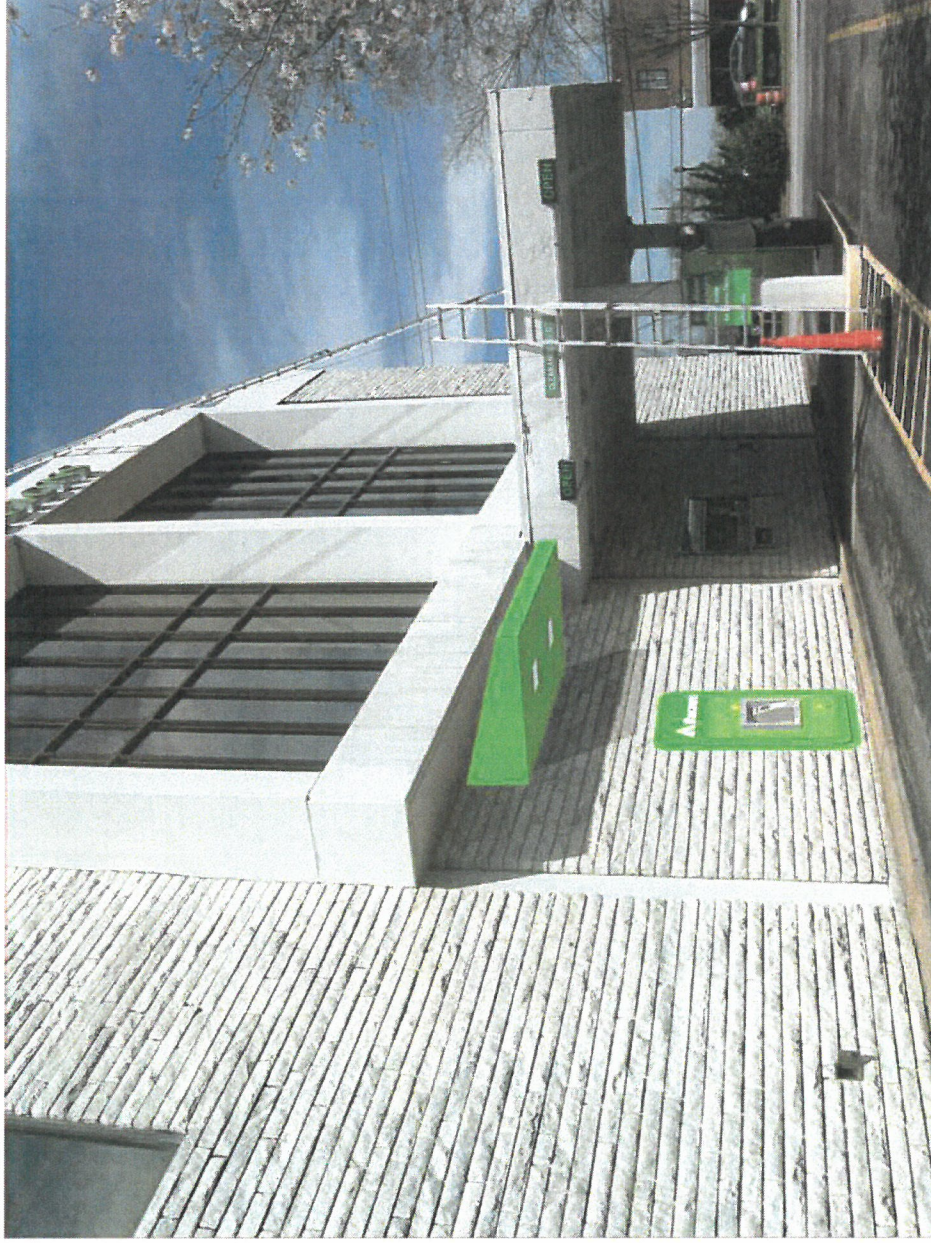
PHOTO ELEVATION DEPICTION INTENDED FOR GENERAL CONCEPT ILLUSTRATION ACTUAL SIZING, COLORS & PERSPECTIVE WILL VARY SLIGHTLY FROM IMAGE
